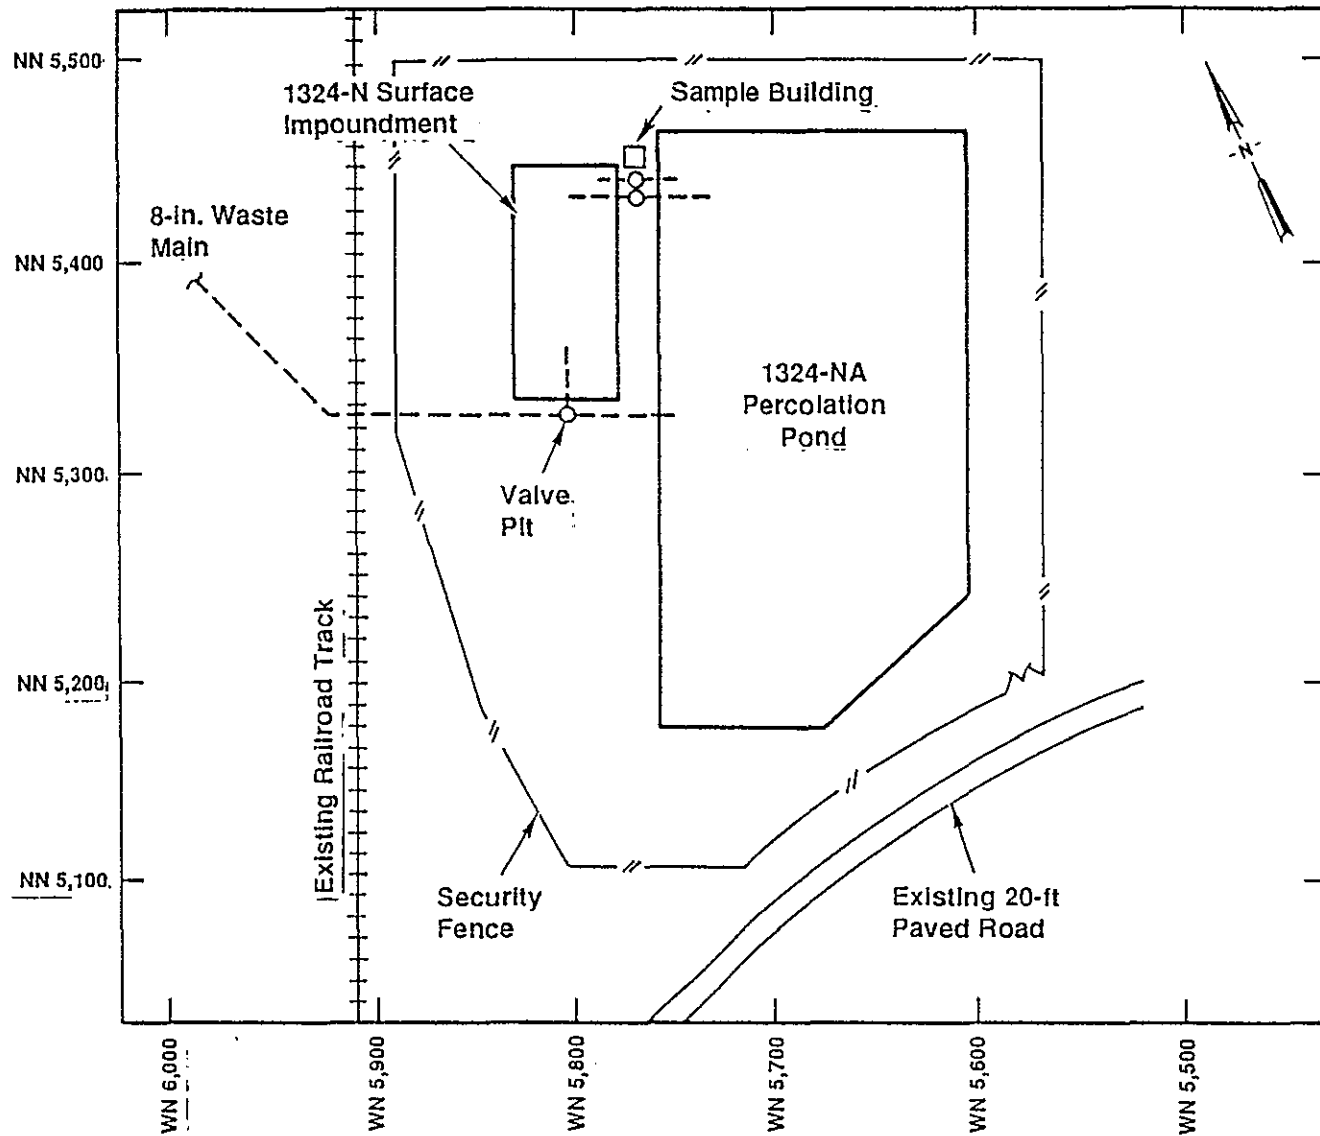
Layout of the 1324-N/NA Liquid Waste Disposal Facility.
